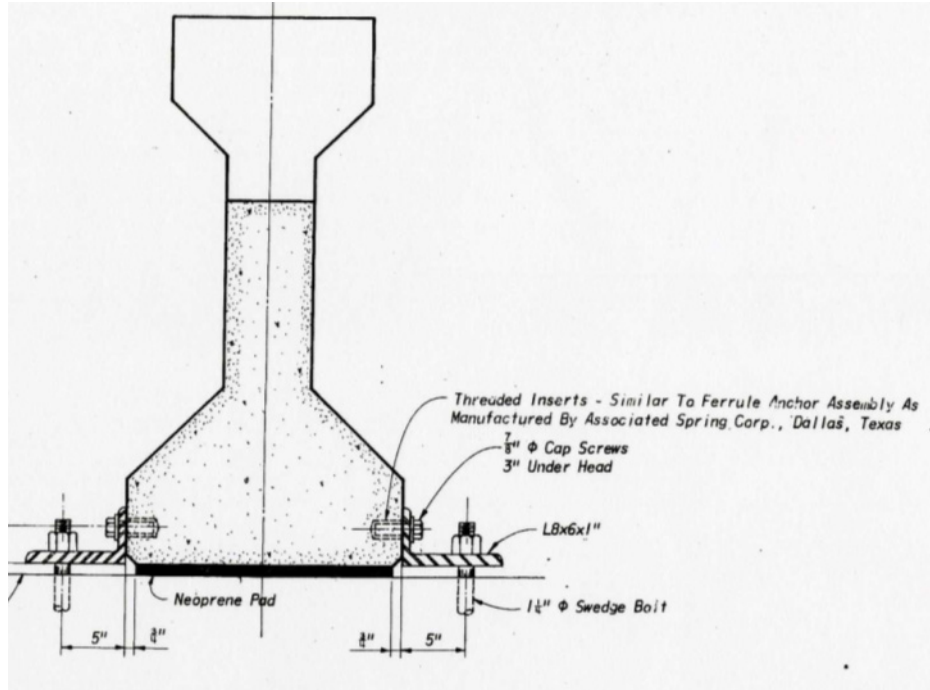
ALDOT Girder Details – Mobile Bay Crossing
